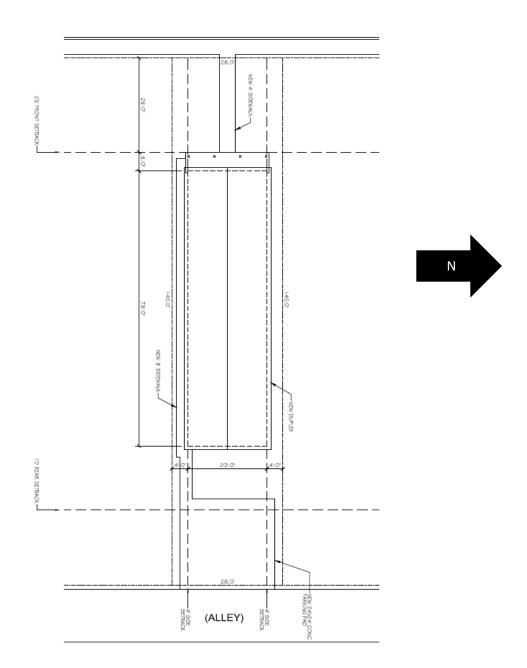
Site plan of the proposed duplex that will be built at 2511 Columbia Avenue.
